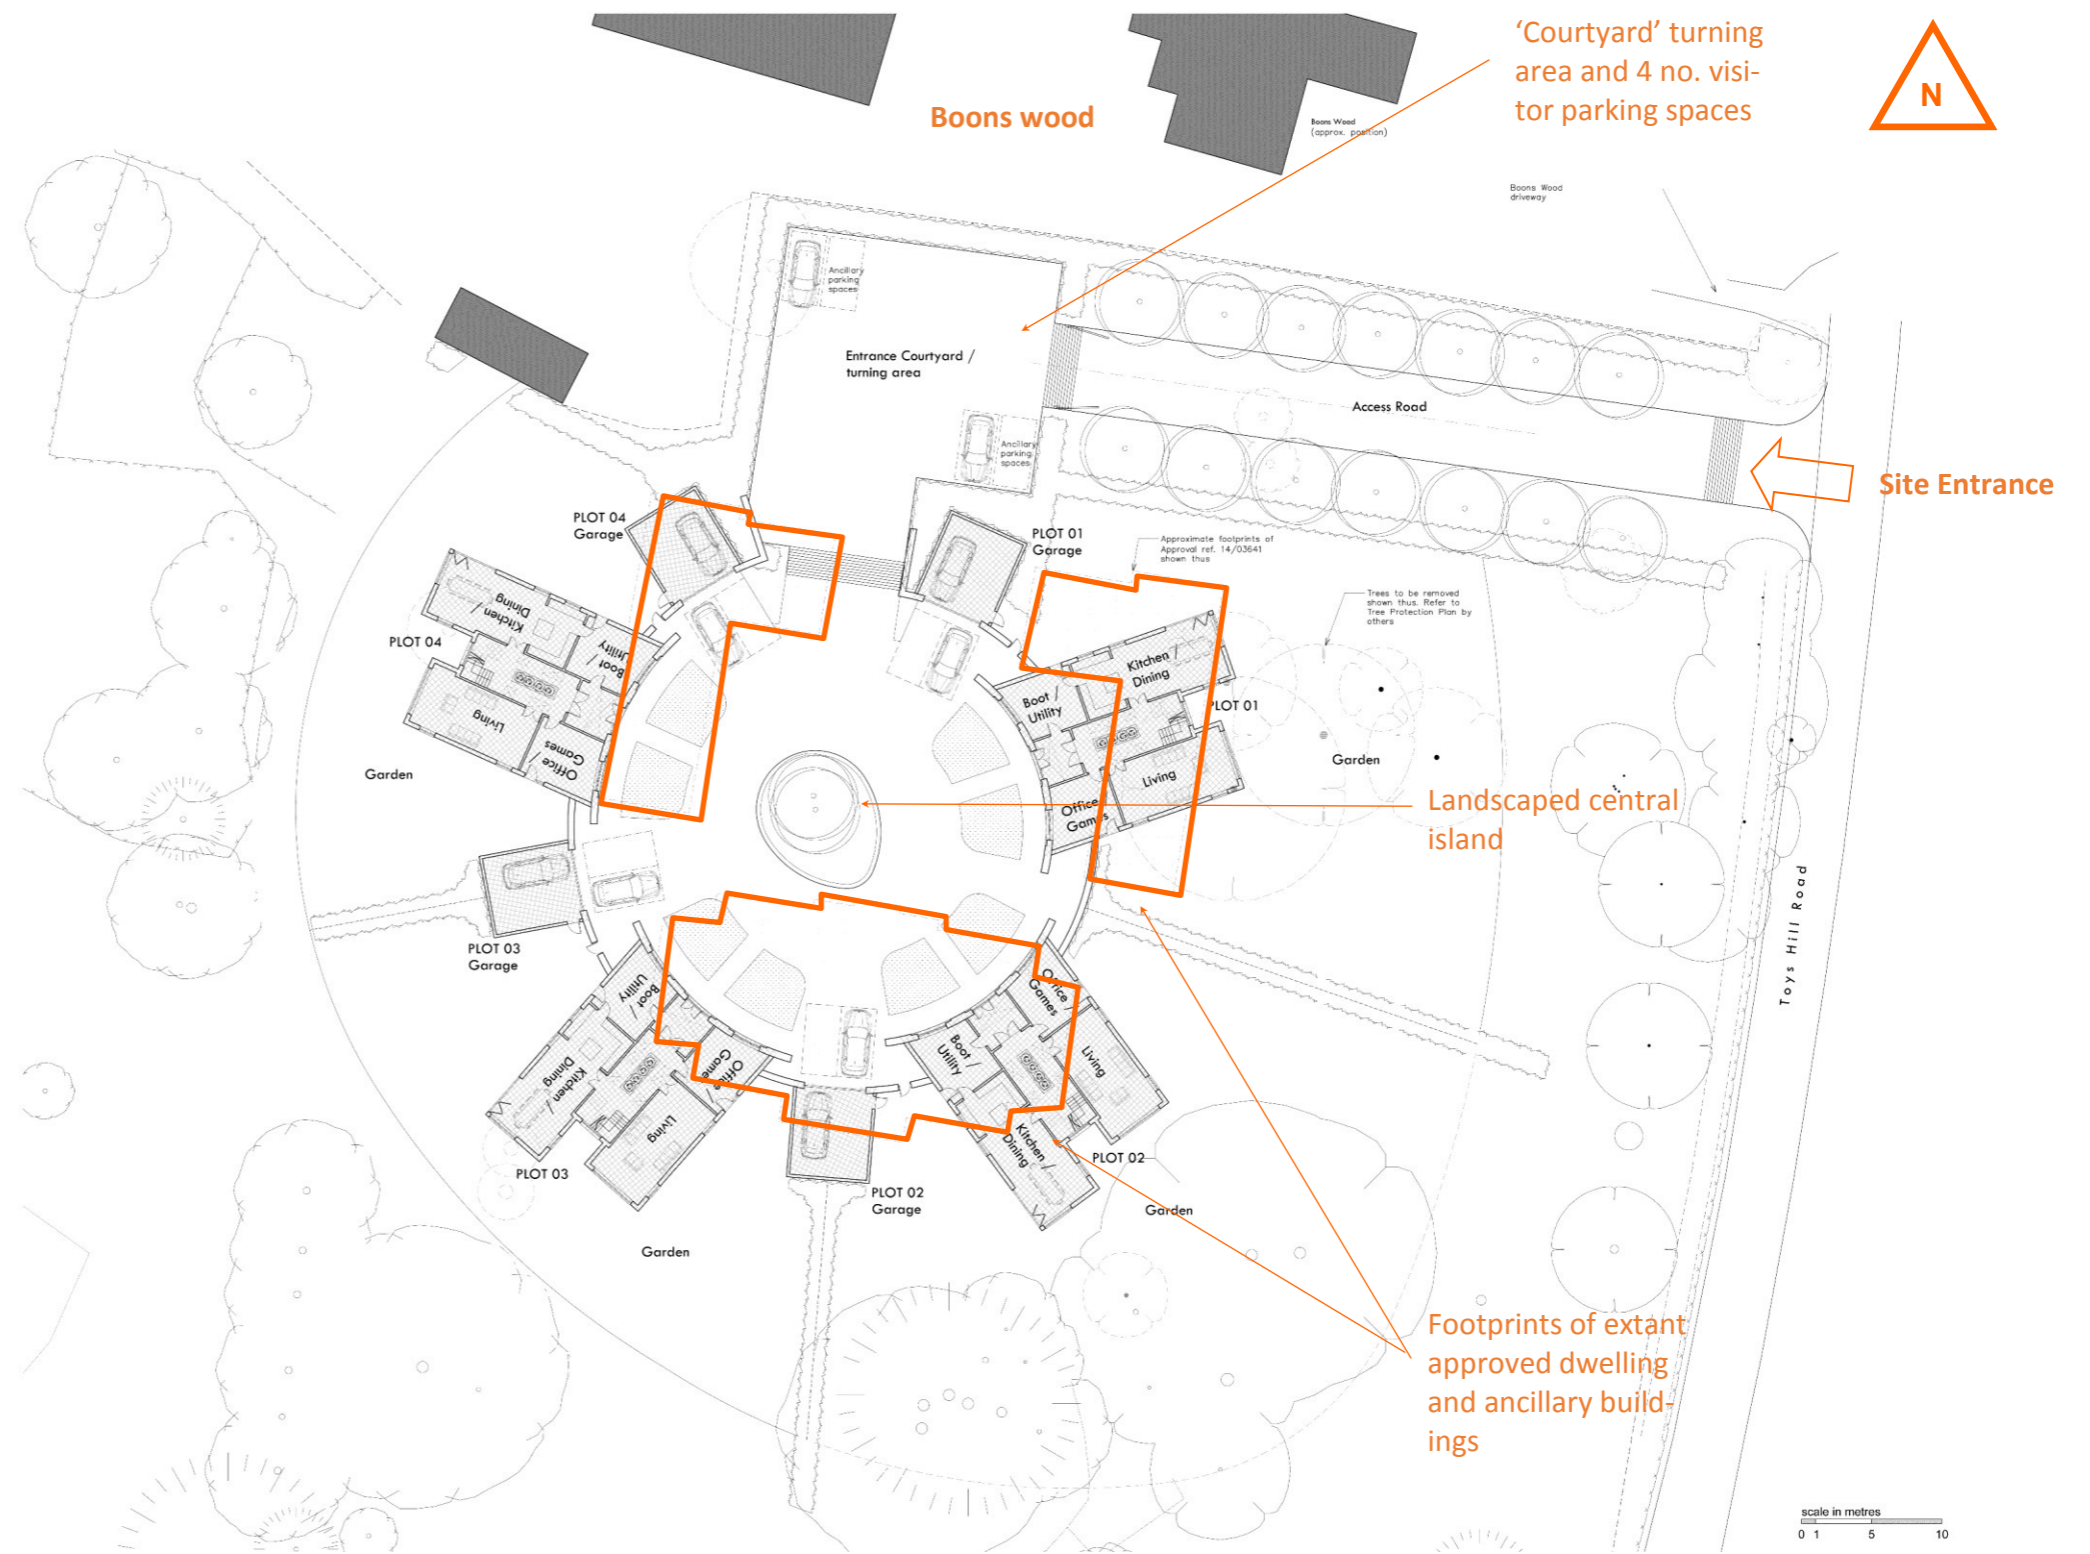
Proposed Ground Floor Plan (nts); refer to drawing 2150/110
